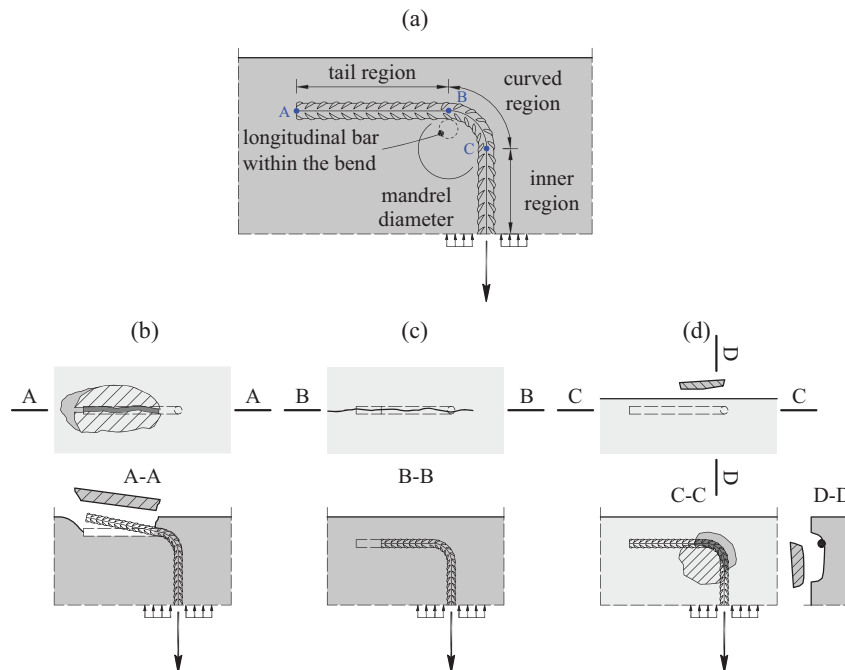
(a) Definition of the a bend anchorage. Type of concrete failures: (b) spalling of concrete cover perpendicular to the bend; (c) pull-out; and (d) lateral spalling failure of concrete cover parallel to the bend.
